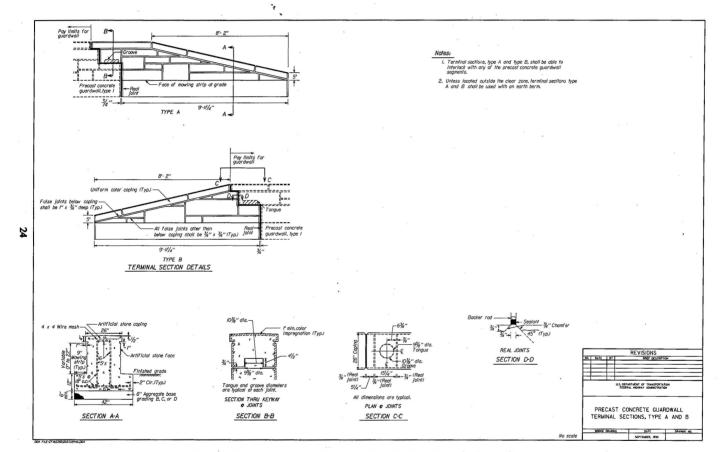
Pre-Cast Concrete Guardwall -- Terminal Details.
